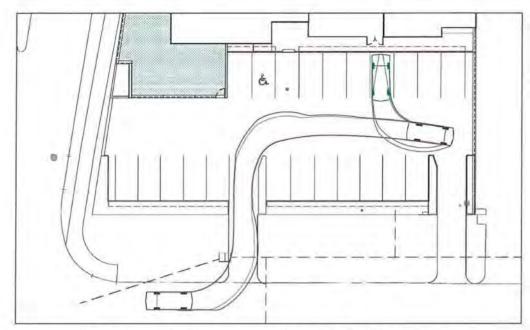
Car Tracked Path – Typical Drop-off – reverse parking
